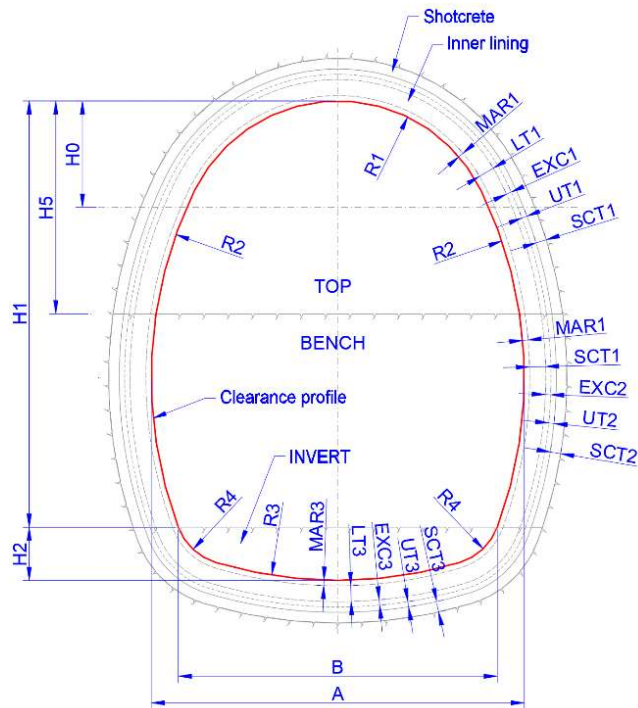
Cross section Type 5, phase 1, 2 and 3 excavation (EXPH=4)
